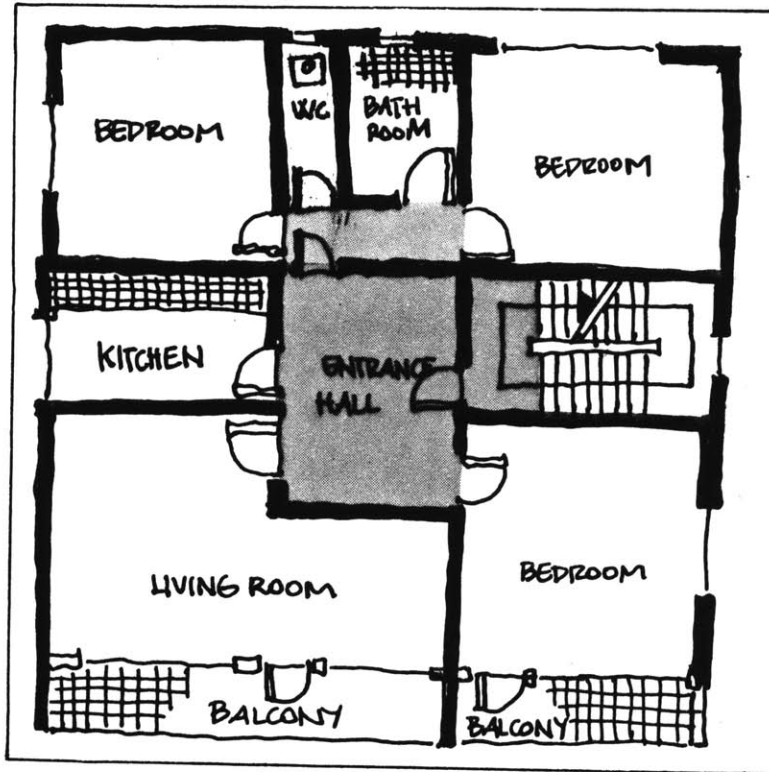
A PLAN TYPE OF A NEW HOUSE IN ANAMUR
